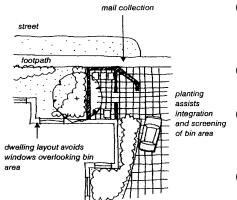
Mail and garbage areas should be integrated with the building and landscaped areas.
